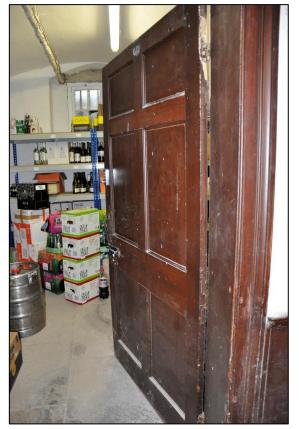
Six-panel door and moulded timber architrave to current wine store (with later stained finish)
